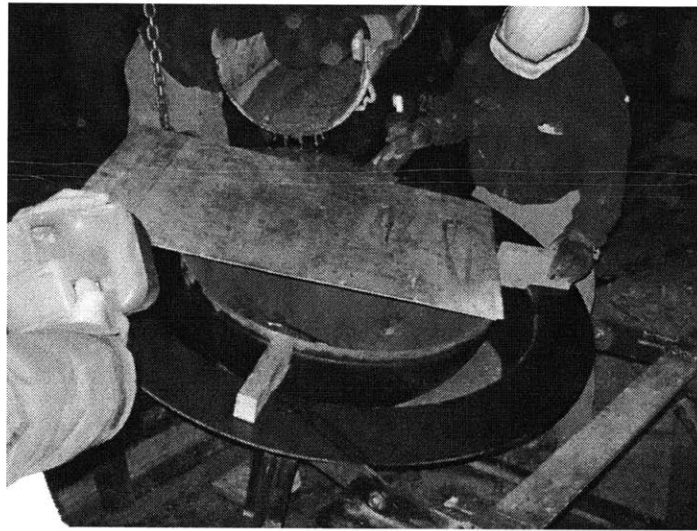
The mold being filled with concrete. Mold release (engine oil) can be seen to darken the surfaces of the mold where contact with the concrete will occur. Bolts holding the mold to the vibration table can be seen bottom right.
